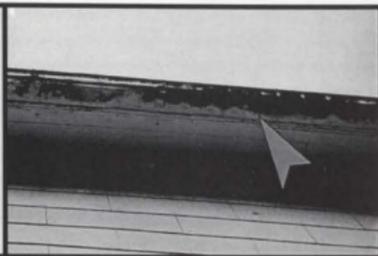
Mold growth and degradation to gutter and eaves on northern elevation.
